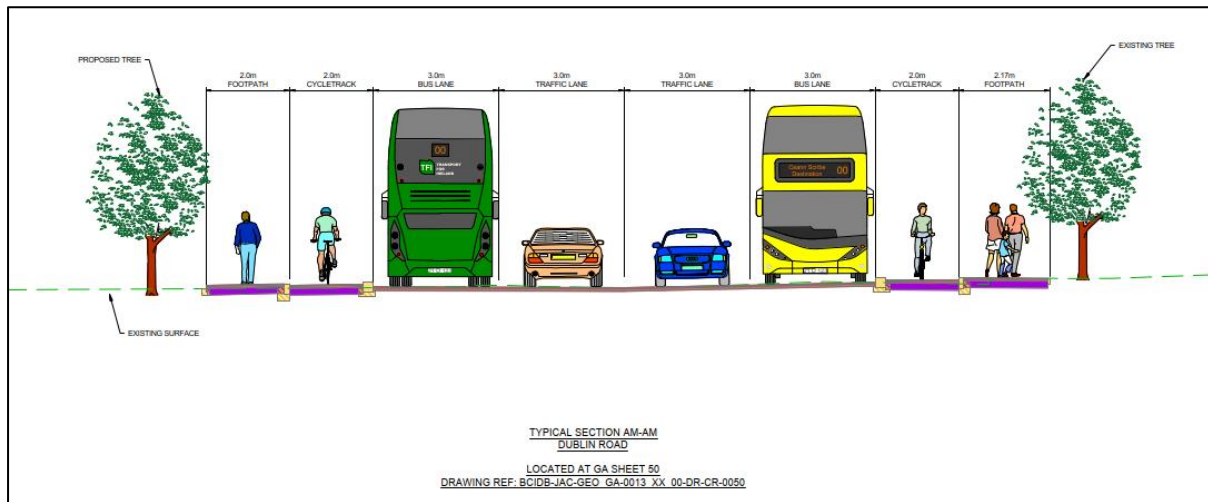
Extract from Typical Cross-section Drawing (Sheet 22)
